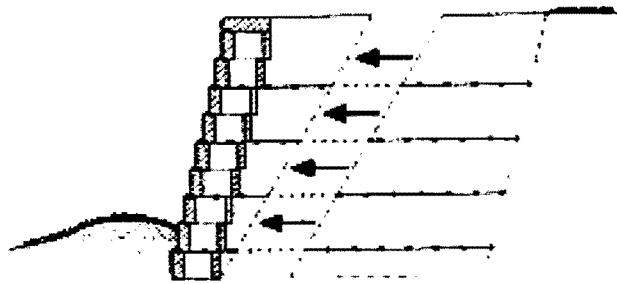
External Stability Failure Mechanisms of MSE Retaining Walls
